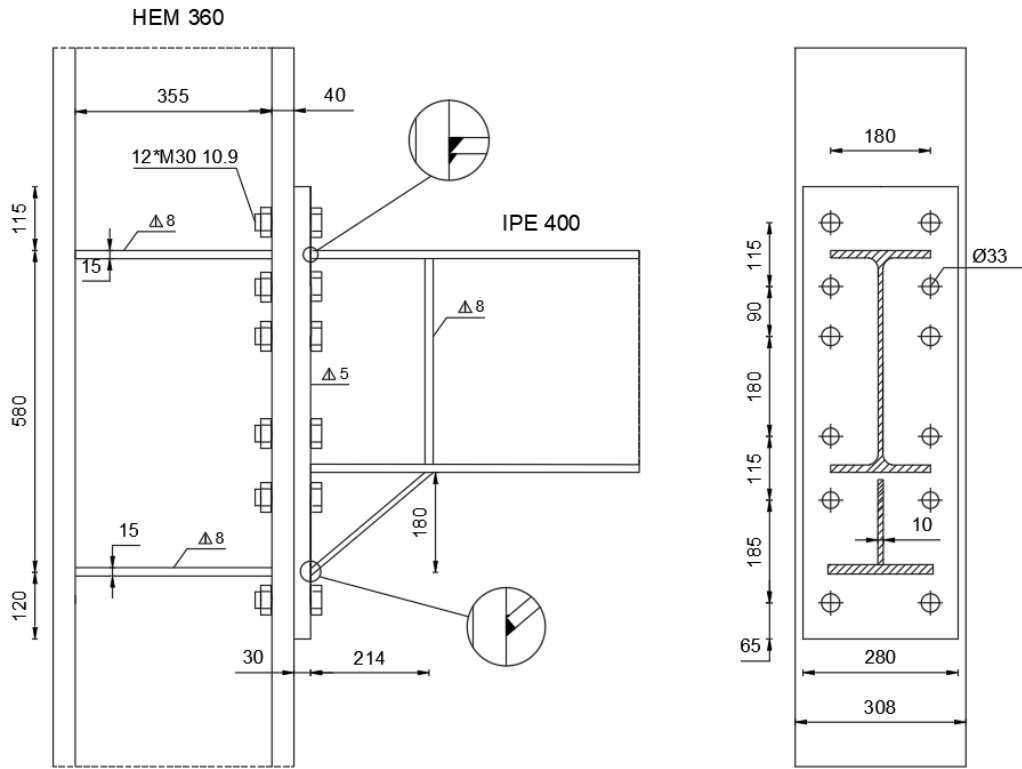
Single-side joint configuration of haunched connection of beam IPE 400
